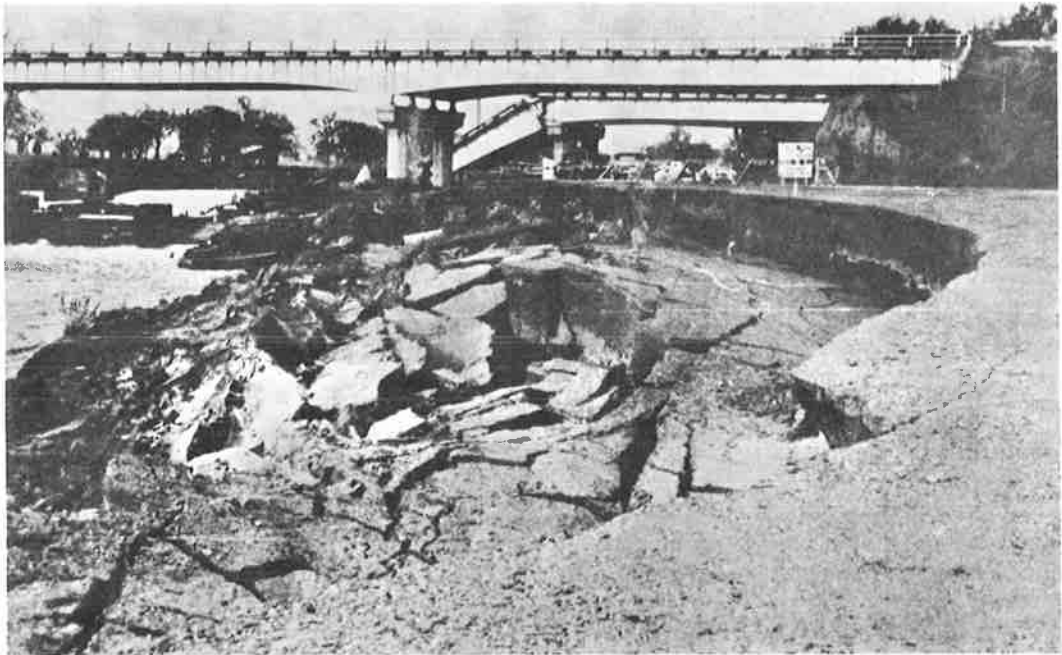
Subsidence of left bank following collapse of upstream I-29 bridge.
